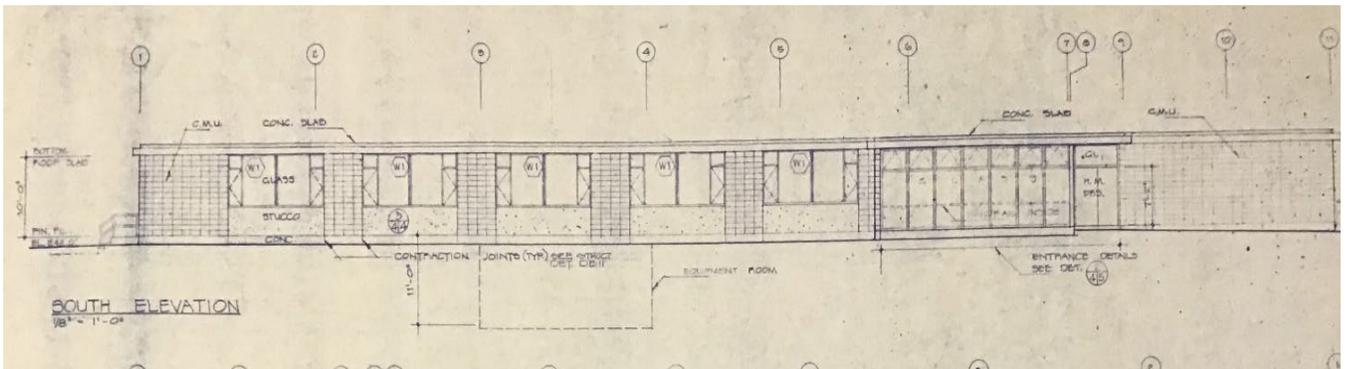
1963 architectural drawing of the south elevation Science Research Lab Annex (CSUMB Facilities 2021)
